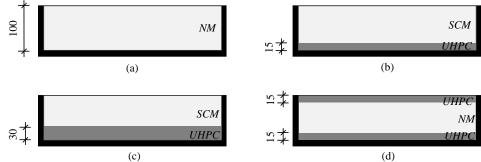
The longitudinal sections of the beams; control beam without UHPC (a), composite beam-1 and 2: 15 mm (b) and 30 mm (c) UHPC layer in the tension zone, composite beam-3: 15 mm UHPC layers in tension + compression zones (d)
